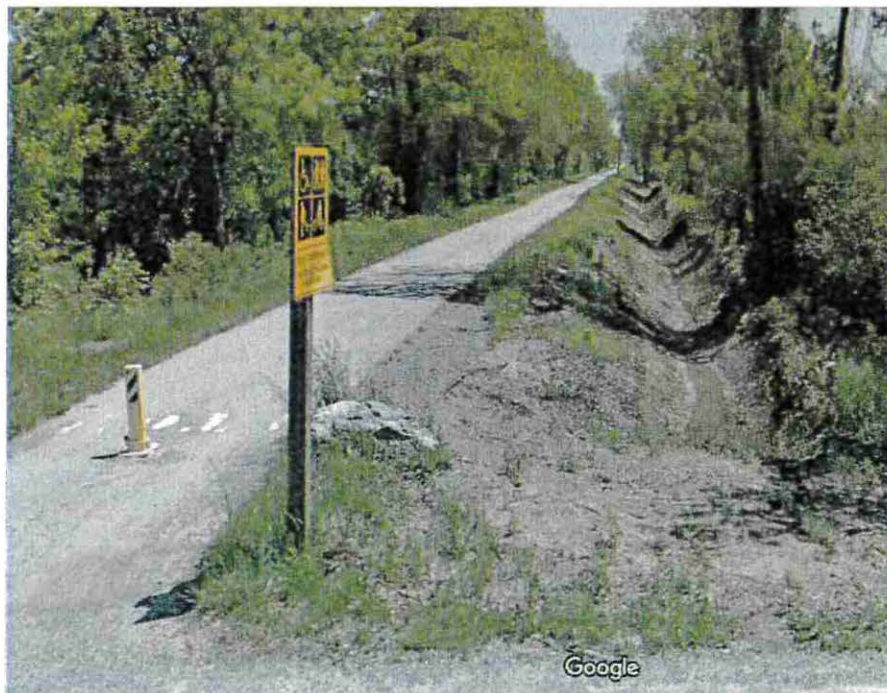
Zavitz West Trail Branch Drain post construction looking East
